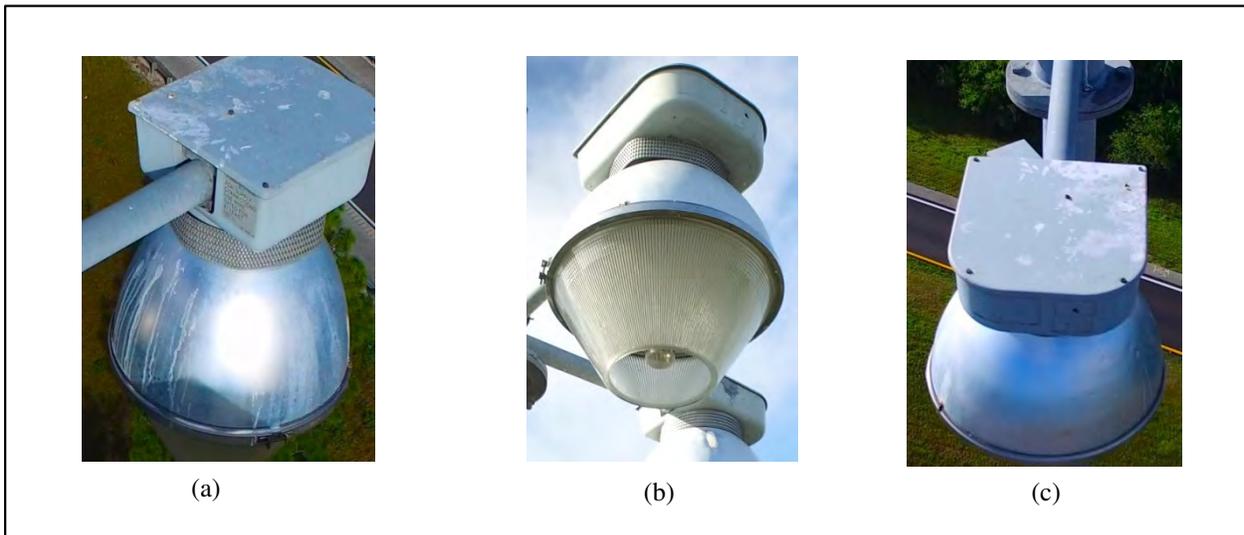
(a) Back (b) Bottom and (c) Top View of North Light Fixture
